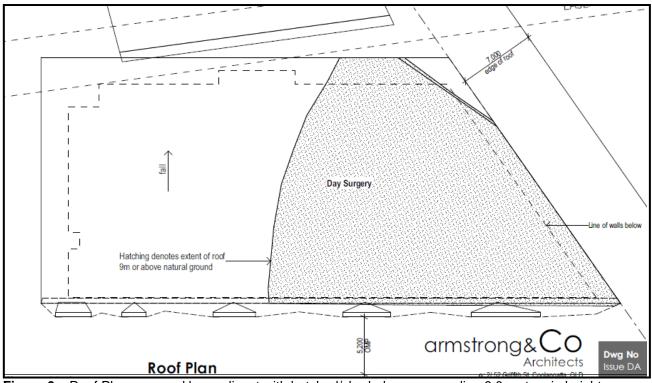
Roof Plan prepared by applicant with hatched/shaded area exceeding 9.0 metres in height
